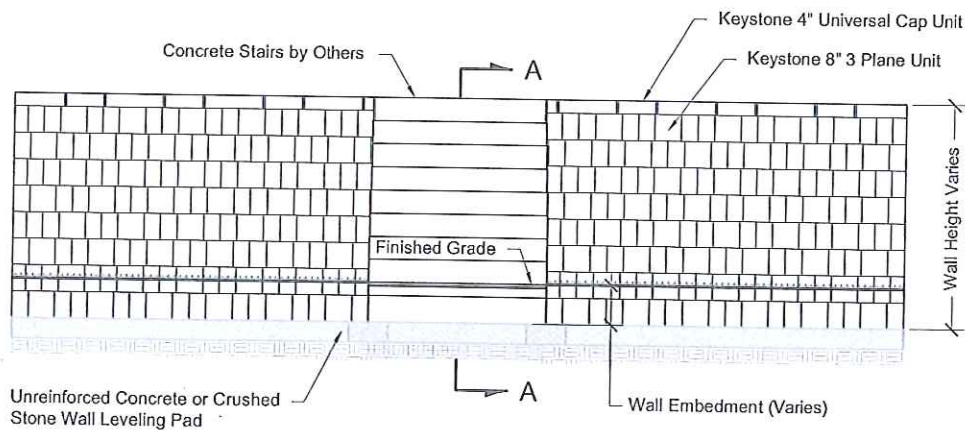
STAIR IN FRONT OF WALL DETAIL PLAN VIEWS
